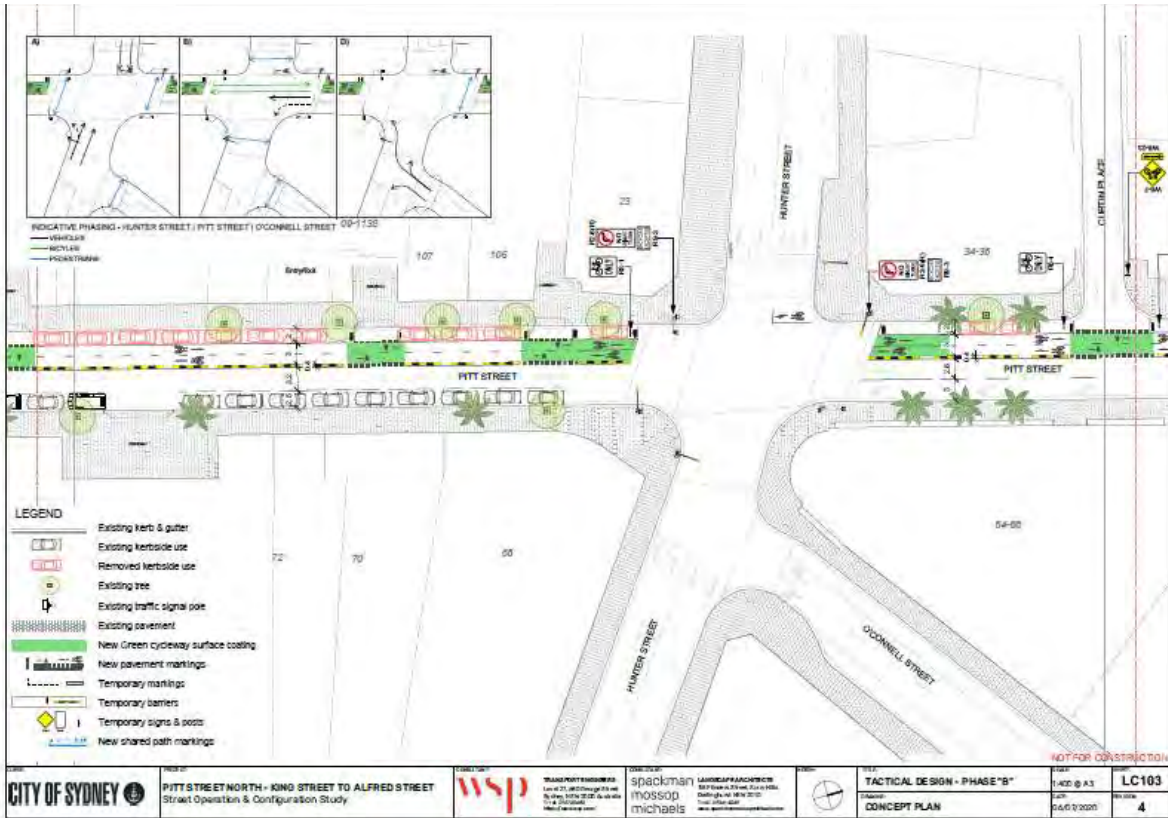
Tactical Design Plan – Phase B – Concept Plan [Drawing LC103 Rev4] (Source: City of Sydney, WSP, spackman mossop michaels, 2020)
